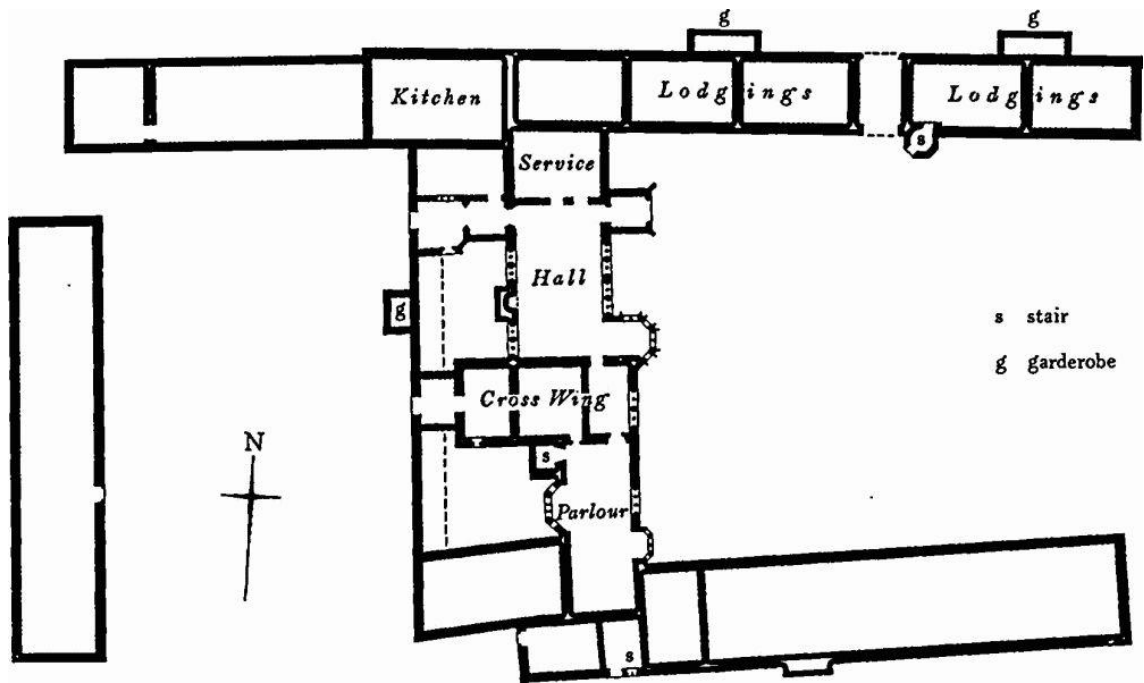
Ground floor reconstruction of Apethorpe Hall, Northamptonshire, 16th century (RCHME, 1984, fig. 21)
